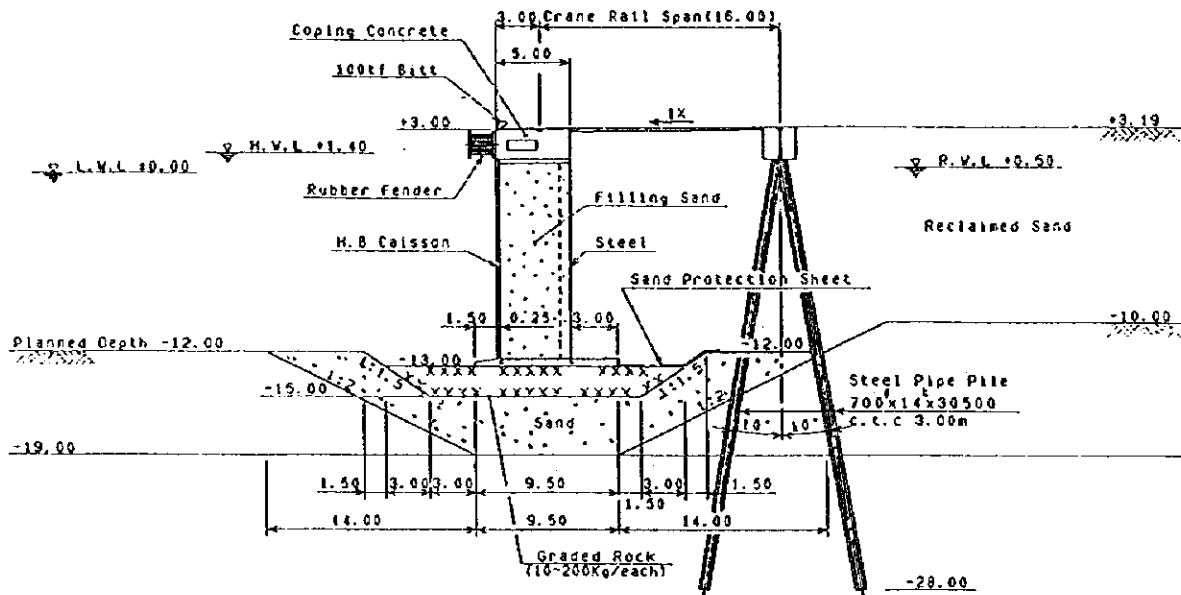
Typical Cross Section of Quaywall E1 in Lien Chieu(Hybrid Caisson)
